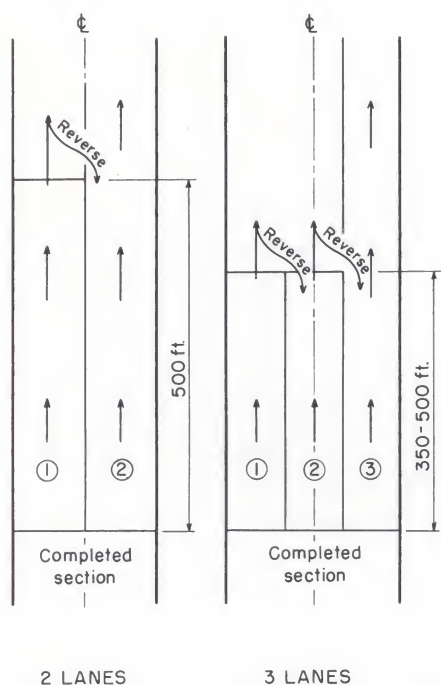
Plans for processing with flat-type traveling mixing machine.
